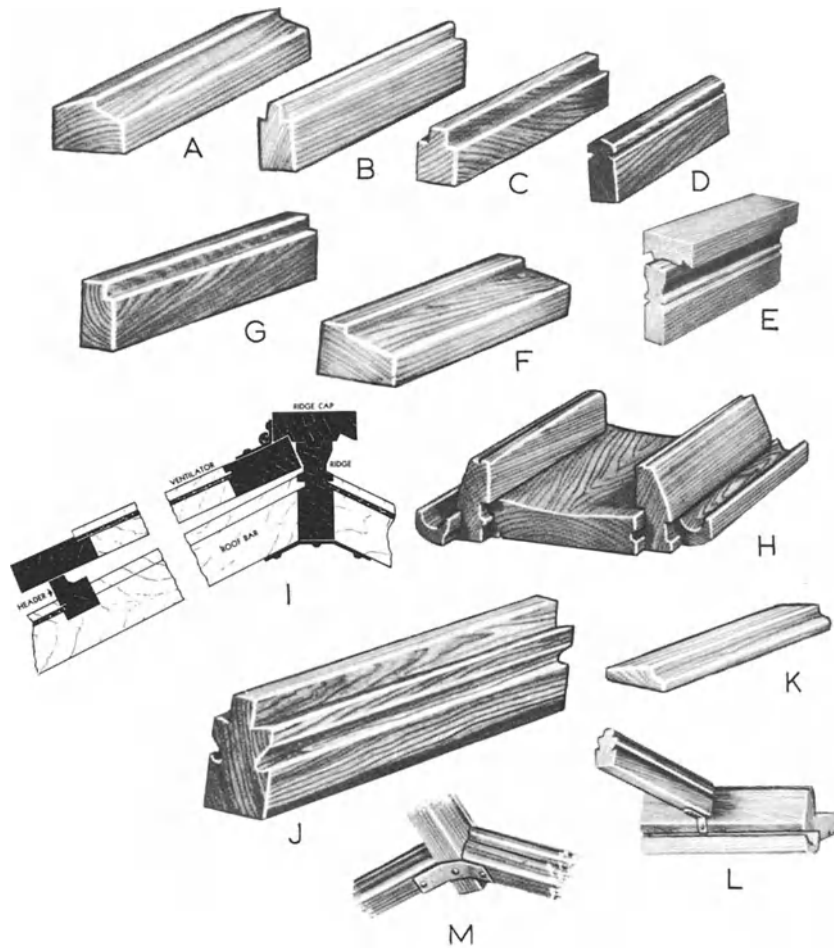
Woodwork for glasshouses. *A* Glazing sill; *B* gable bar; *C* side wall bar; *D* ridge; *E* ridge and cap; *F* sash sill; *G* gable bar; *H* gutter; *I* wood vent sash for roof; *J* roof bar; *K* glazing sash; *L* eave bar tie; *M* ridge bar tie. (Courtesy National Greenhouse Company)
